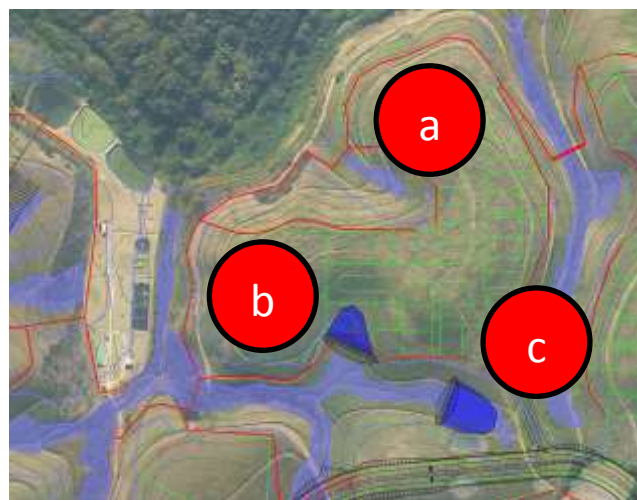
Layout Alternative Three (a, b & c) – Irrigation Dam Locations
